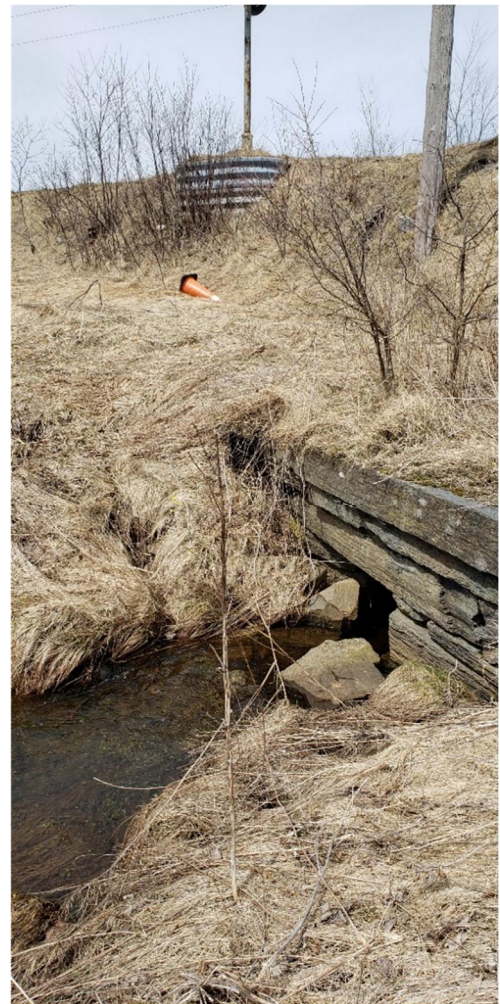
Downstream Side of Box Culvert Crossing at Highway 1 Railway Crossing
